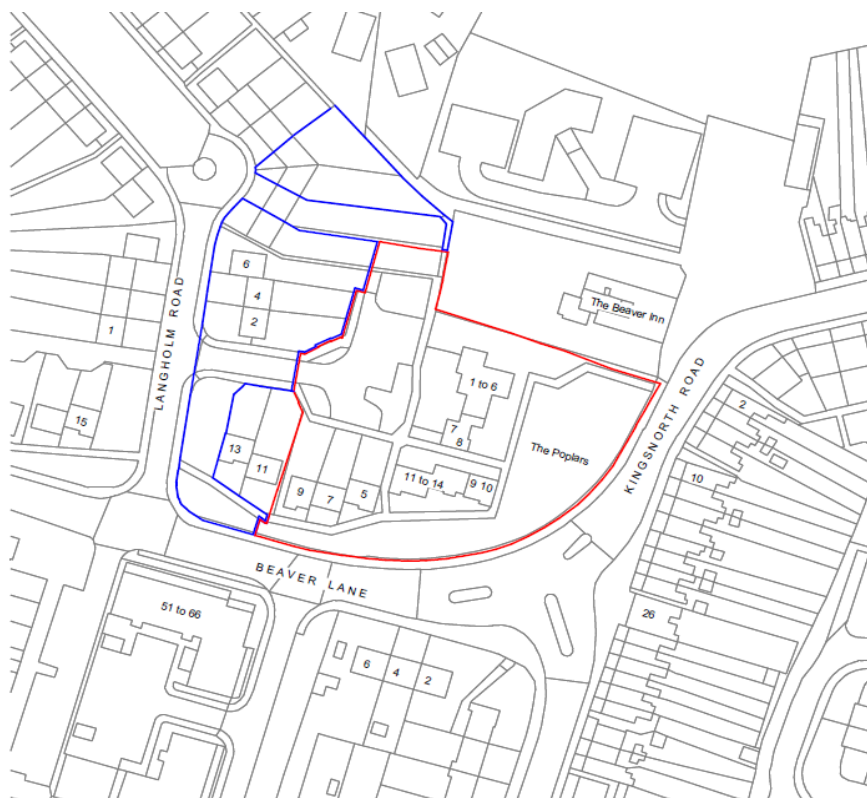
Existing site location plan (and adjacent land owned/controlled by the applicant shown edged blue)
